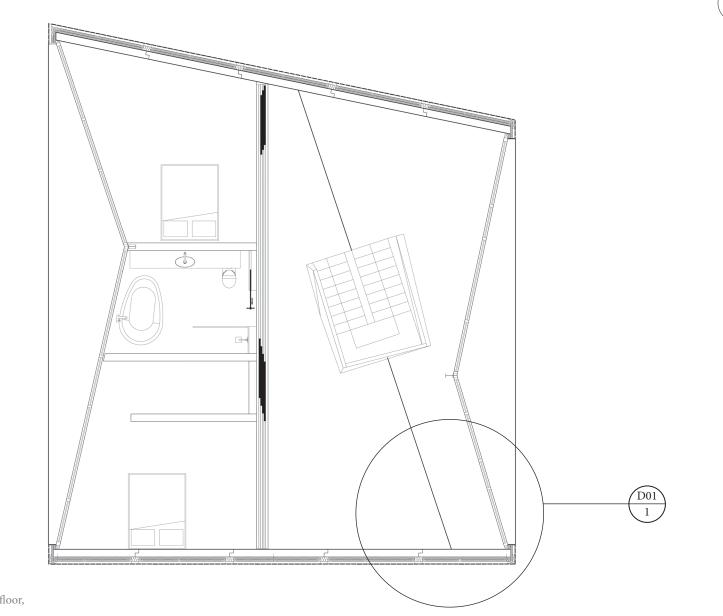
Example plan view of first floor, Scale 1:100 at A4 1:50 at A2 Ν
